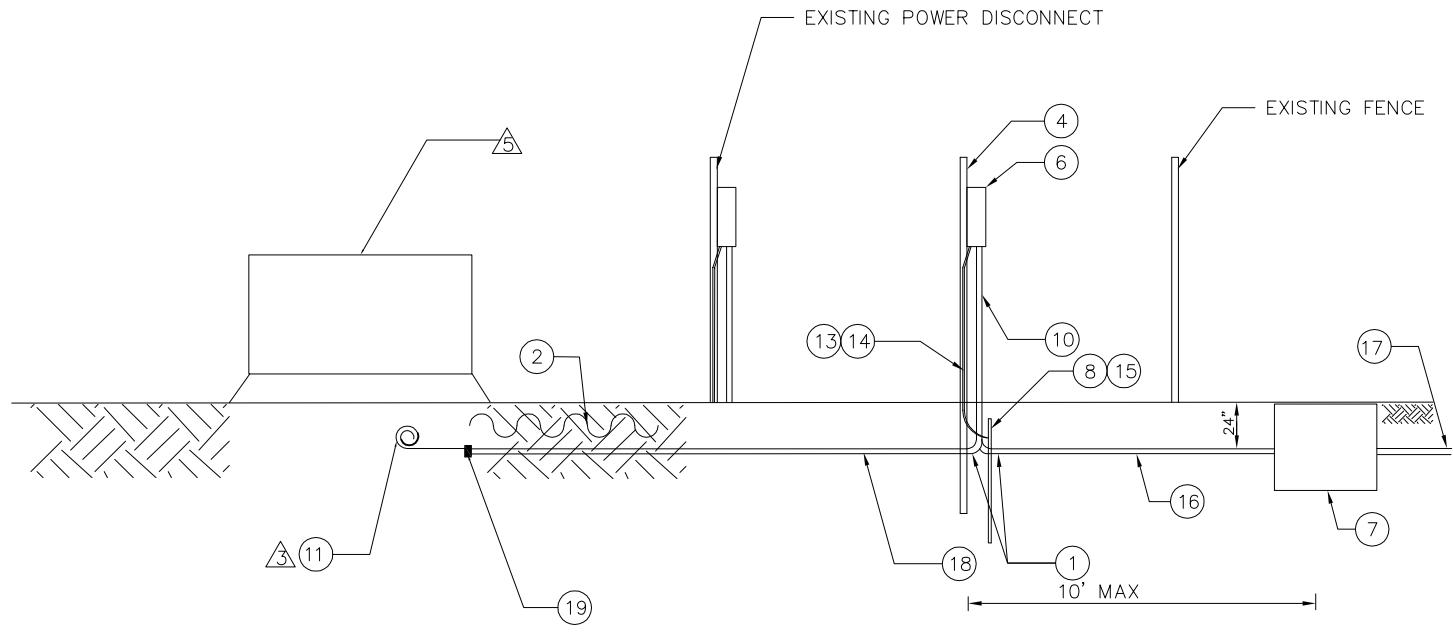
POWER SERVICE, TYPE E, AS PER PLAN
